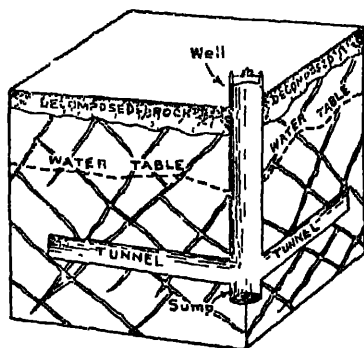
, shows that by tunnelling in rock, with fissures lying at a high angle, new water bearing fissures are struck quicker by tunnelling than by sinking.
